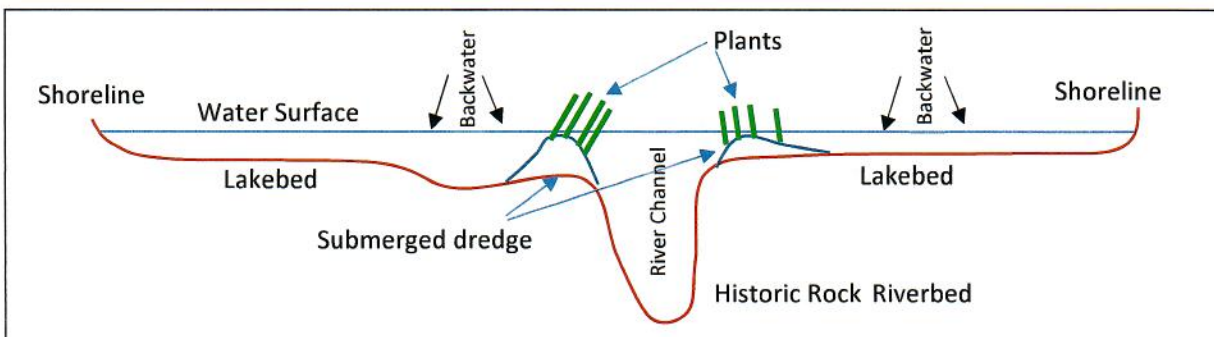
Proposed action to wall of channel sediment from lake with underwater placed sediment embankments. The embankments can serve as access for equipment to maintain river channel depth.
